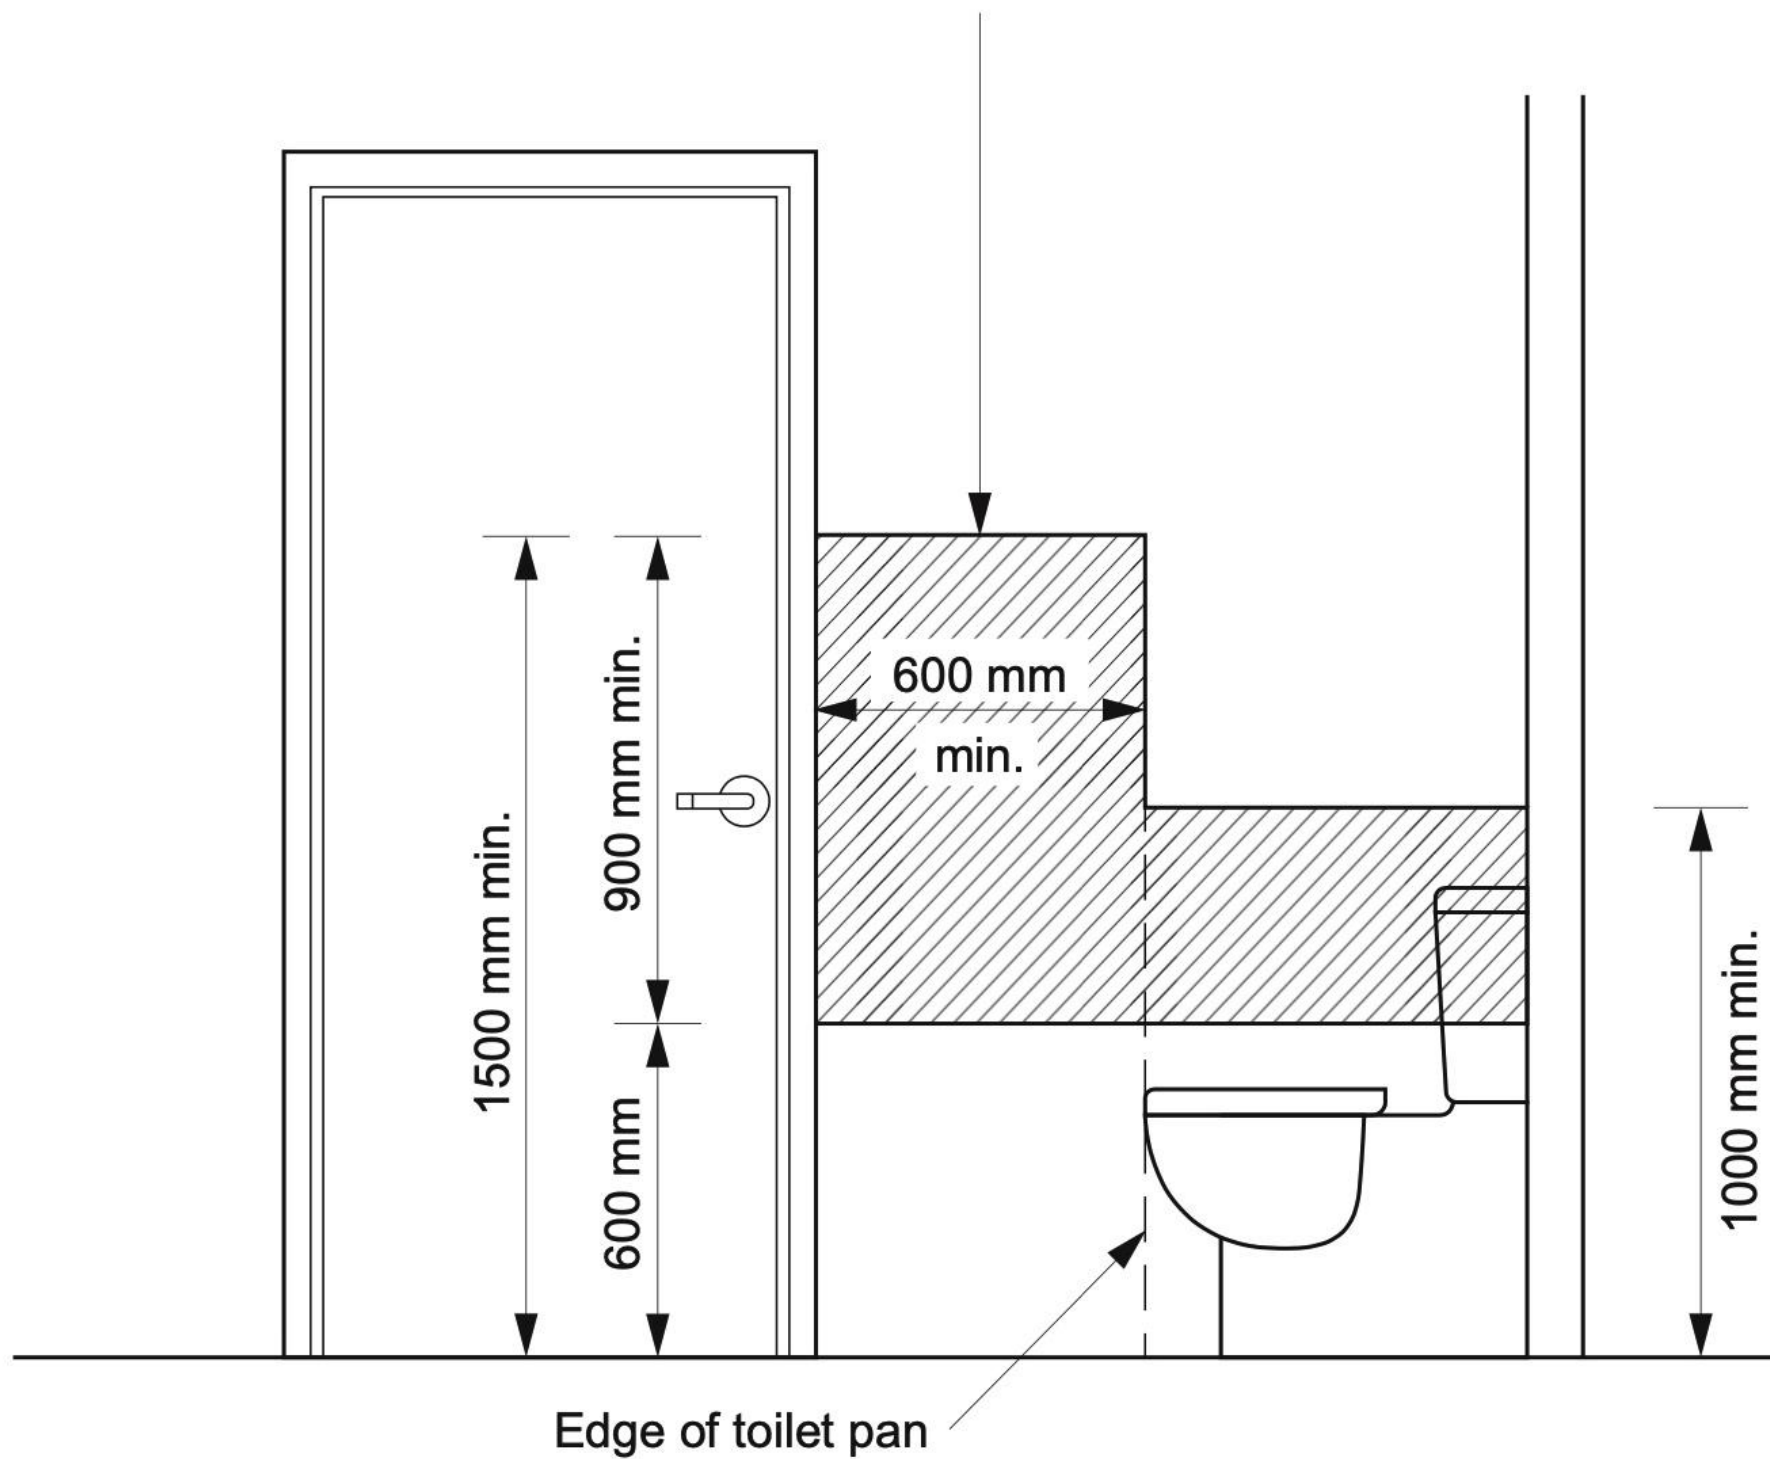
Minimum extent of sheeting for wall adjacent to a toilet pan
